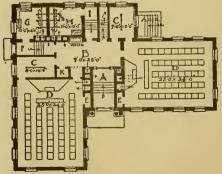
Floor Plan of Two-room Schoolhouse. With Fig. 19.
